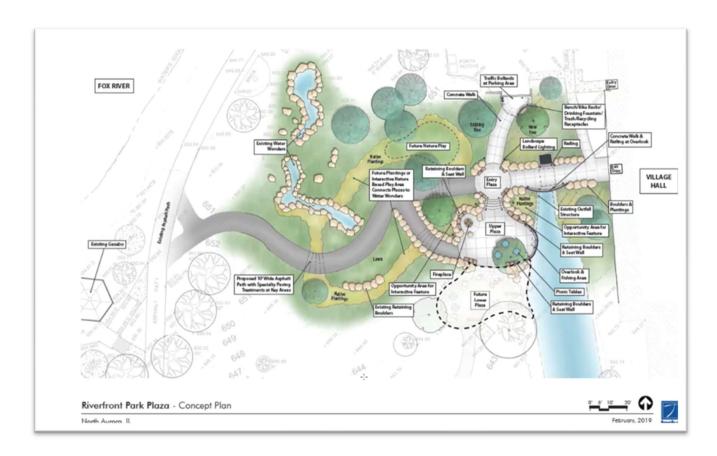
Future Riverfront Park Plaza Plans (Village of North Aurora, 2021)
